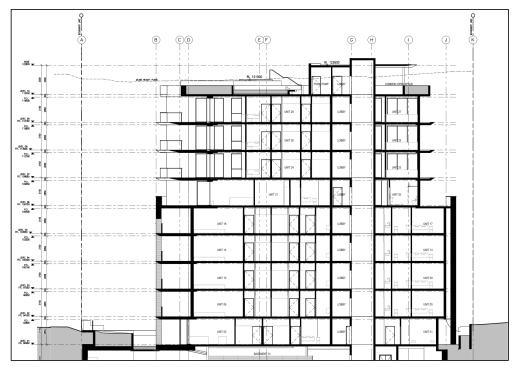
A long cross section of the development, shows the proposed elements to the 28.6 metre building height limit (denoted by the dotted line) Source: PSI Architects, 2025
